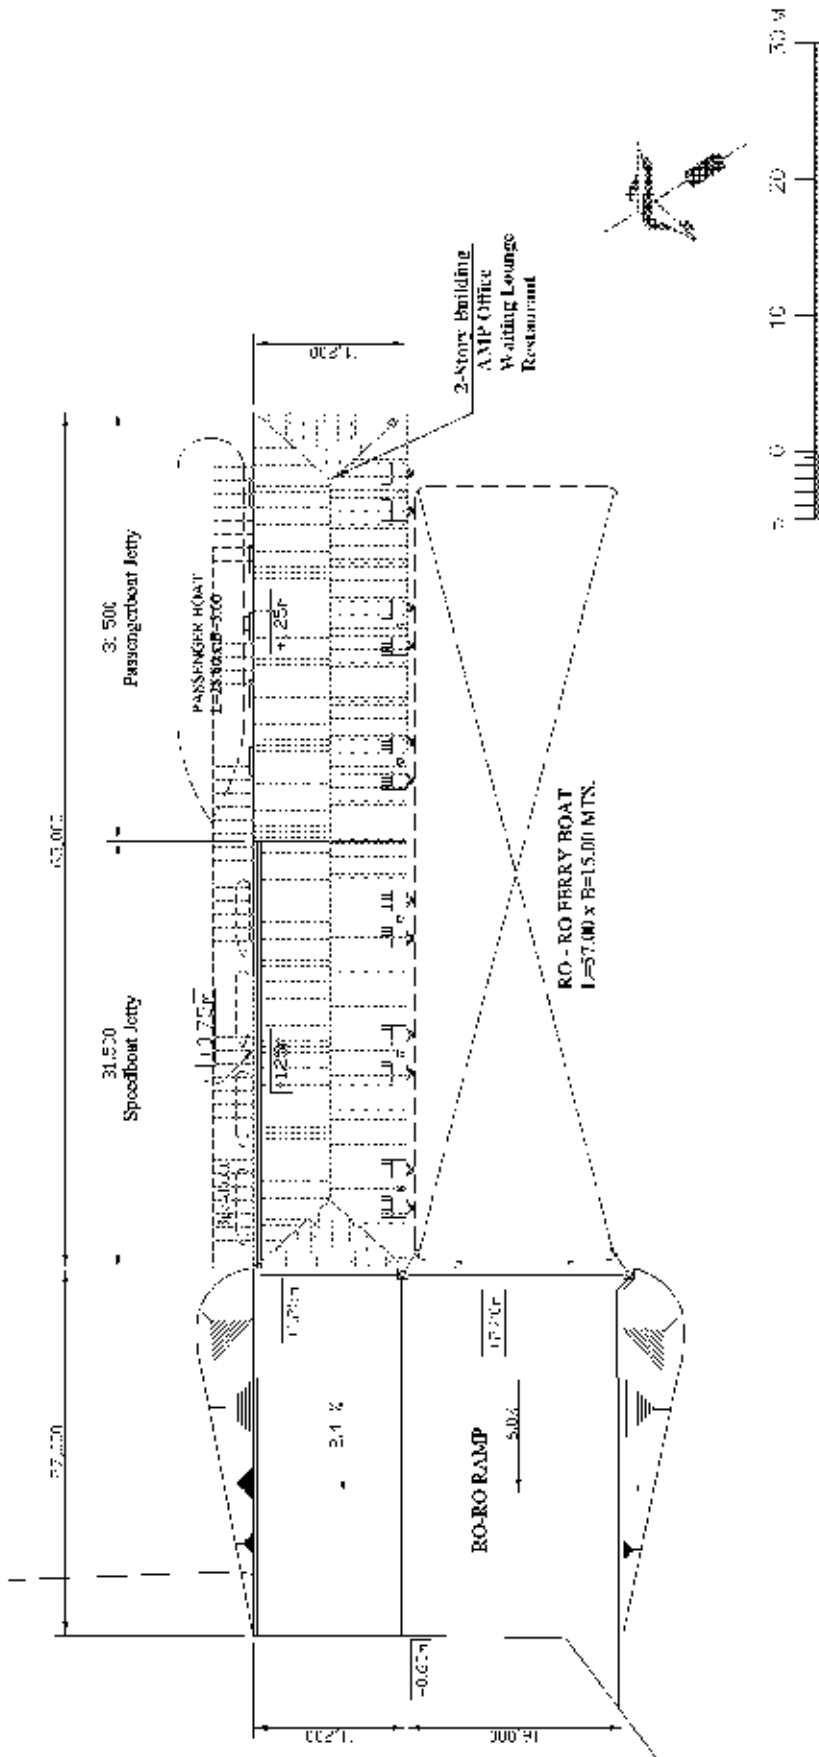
General Layout Plan of Marine Facilities (Bocas del Toro)
